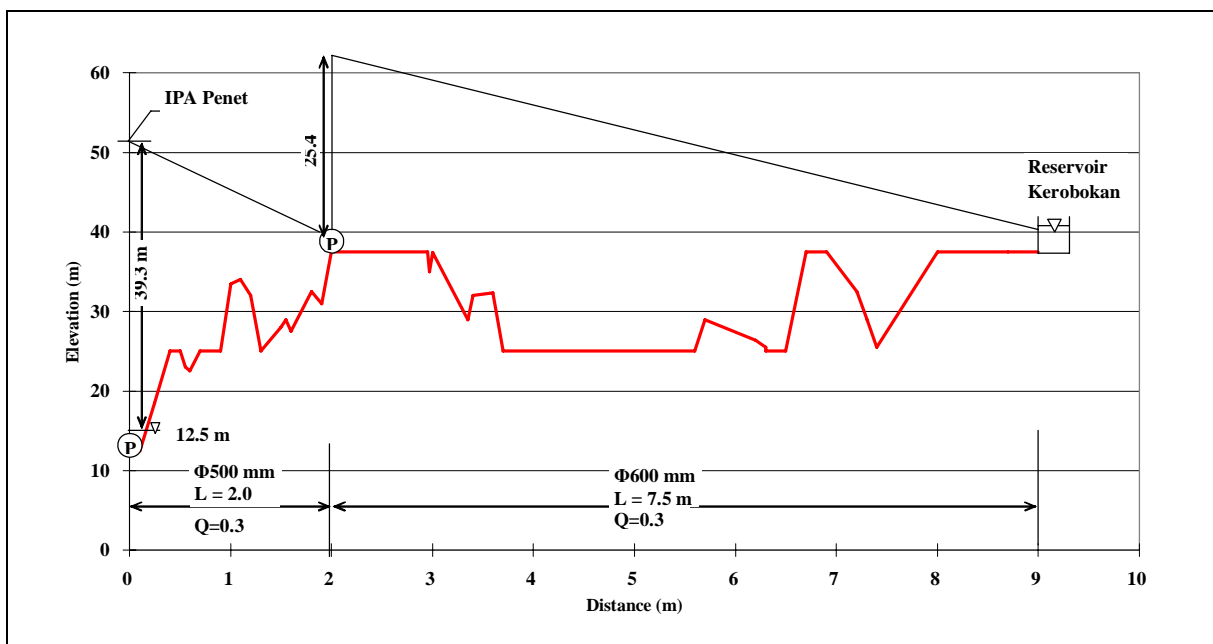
Longitudinal Section and hydraulic Gradient Line of Alternative W2
